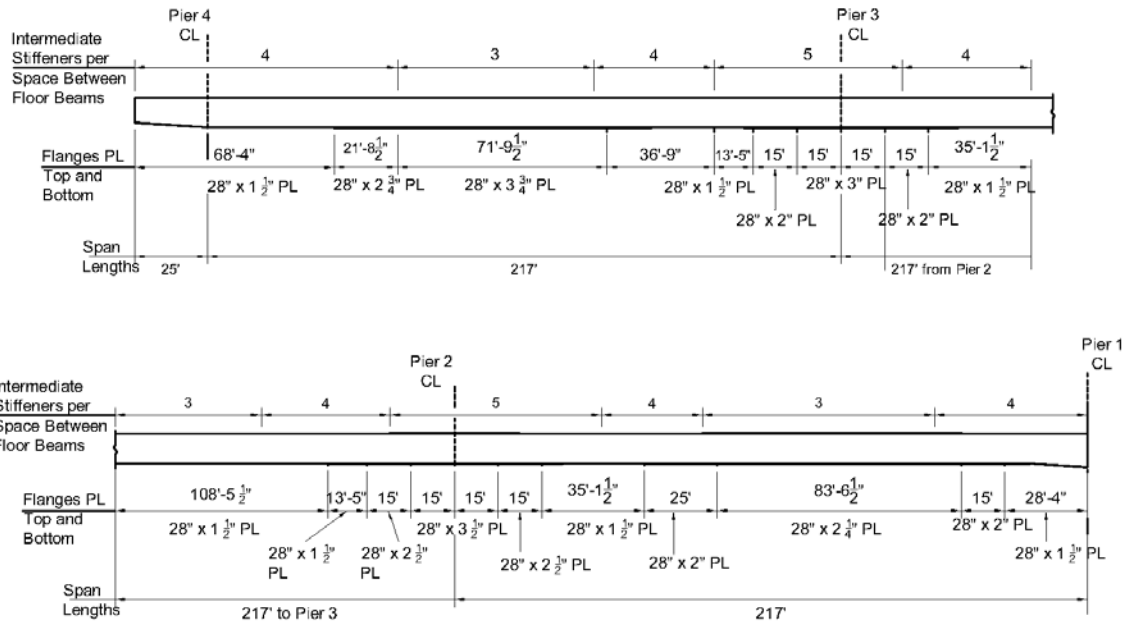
Assembly of steel components of the three-girder bridge.
